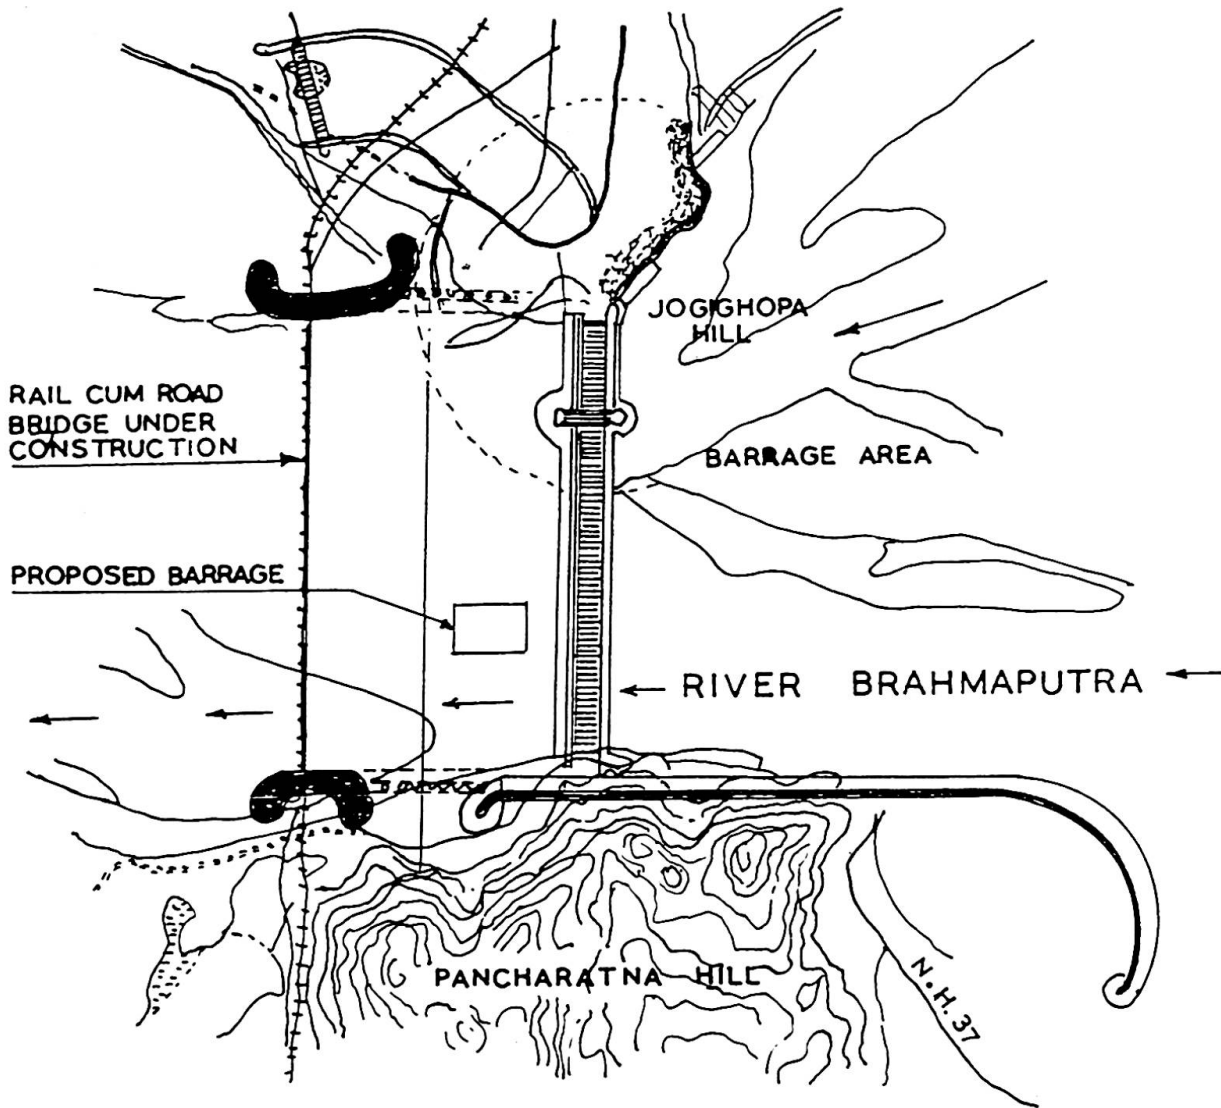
LOCATION PLAN OF JOGIGHOPA BRIDGE
